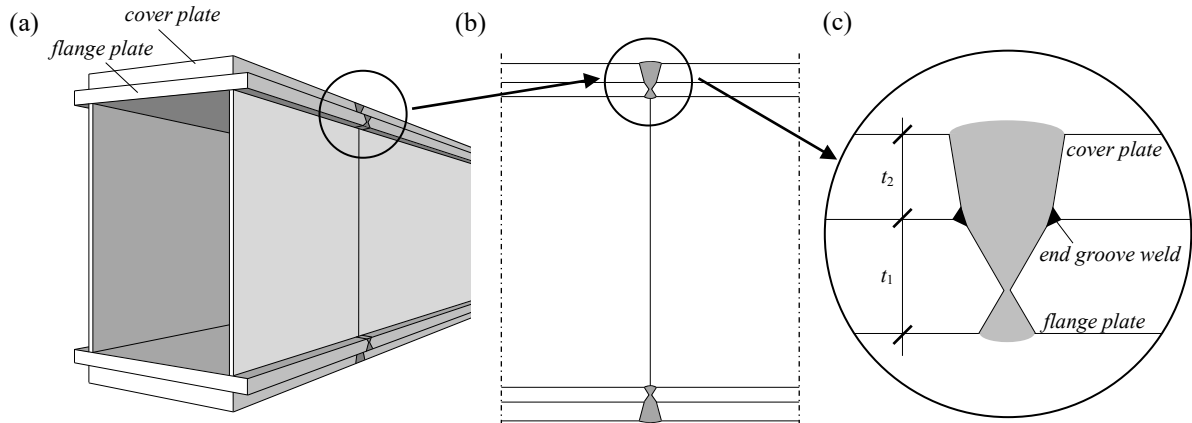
Welding detail lamellae joint: (a) and (b) overview, (c) detail.
